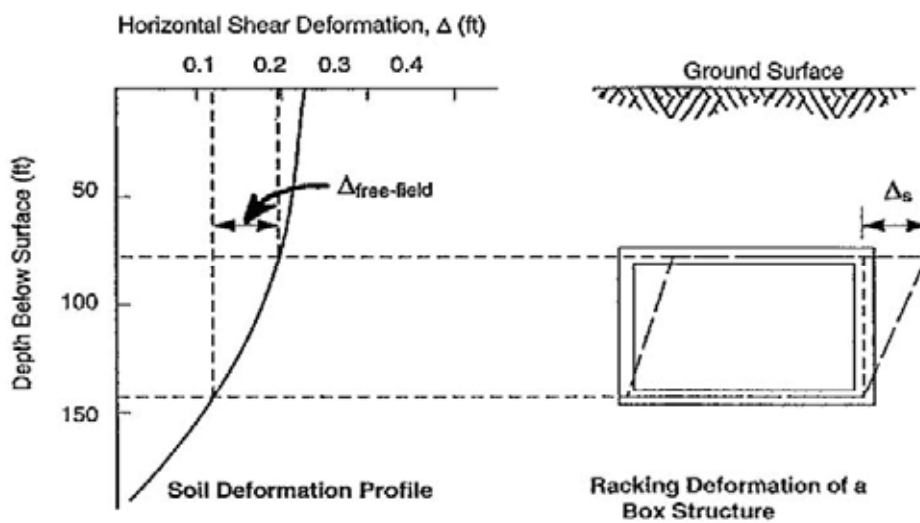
Racking Deformations of A Rectangular Conduit
